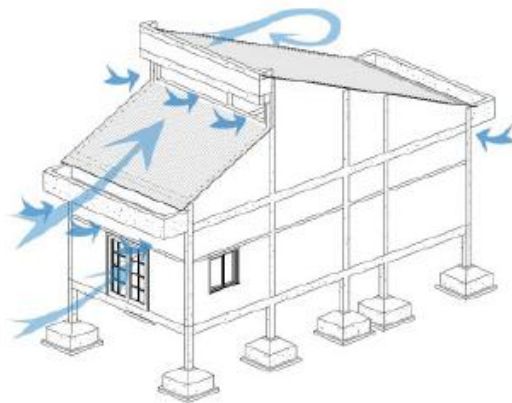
The tube house roof design & structure (Source: ISET, 2013)
